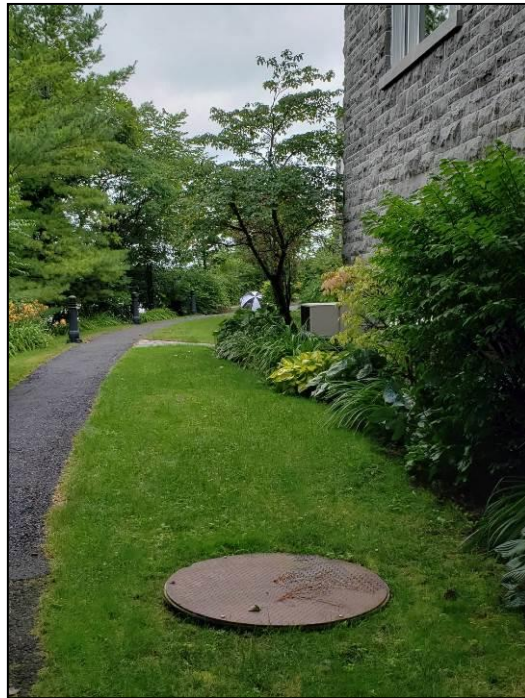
View of the lands to the west of the house, showing the grease trap, facing northwest. (PR19-032D037)
